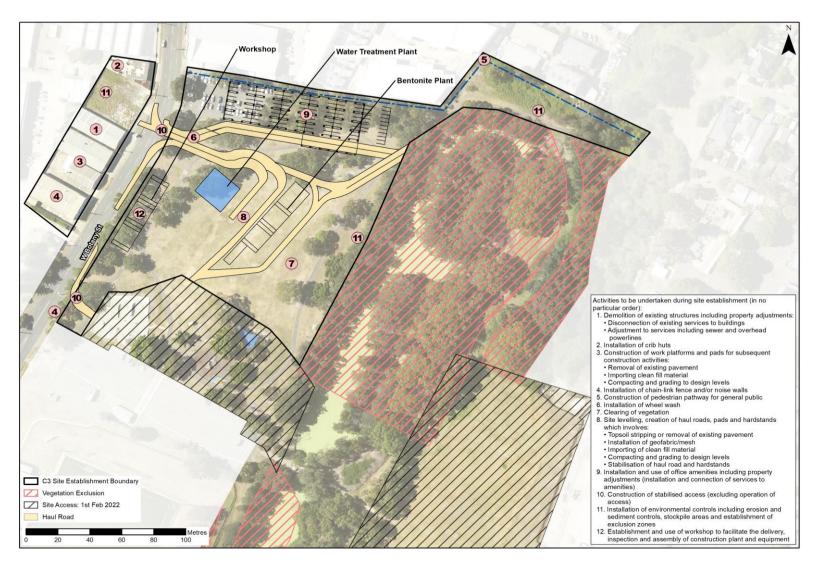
Preliminary construction at President Ave construction ancillary facility (C3)
